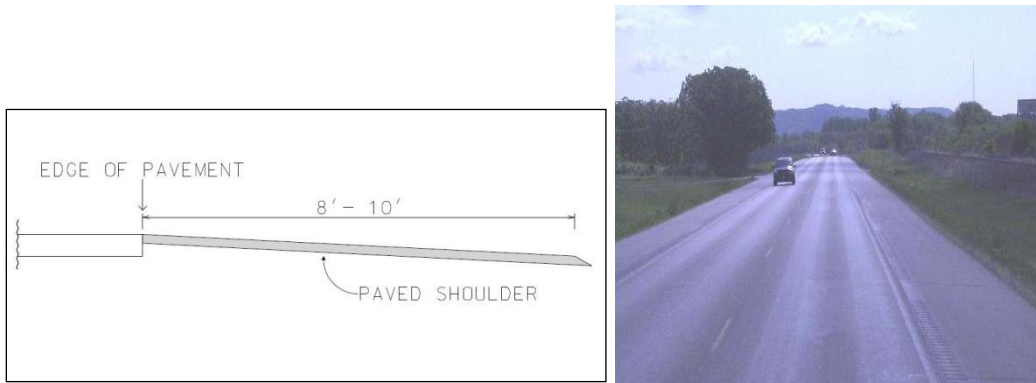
Before Condition: Paved Shoulder; After Condition: Paved Shoulder with Rumble Strips
